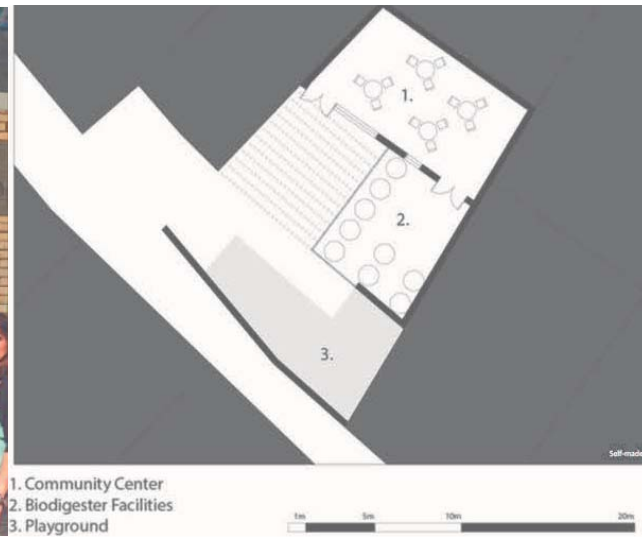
Bio EnGen plan: (1) community center; (2) bio-digester facilities; (3) playground
